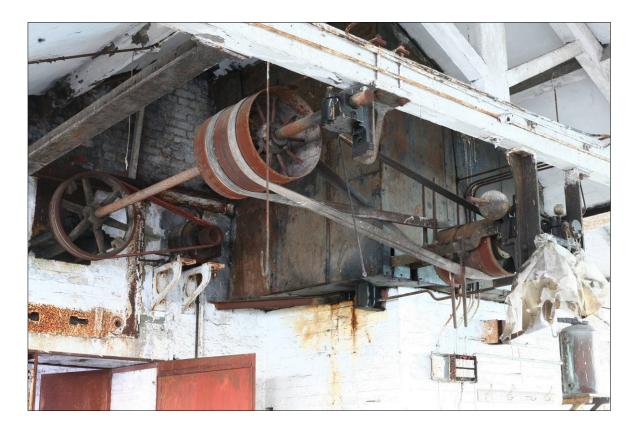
Detail of surviving gearing powering the inserted lift in the centre of the east wall.
